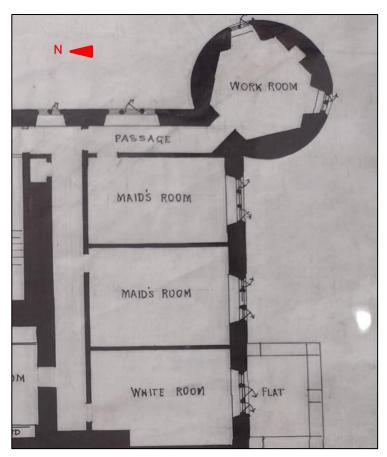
Extract from the 1909 floor plan of Cell A, third floor
